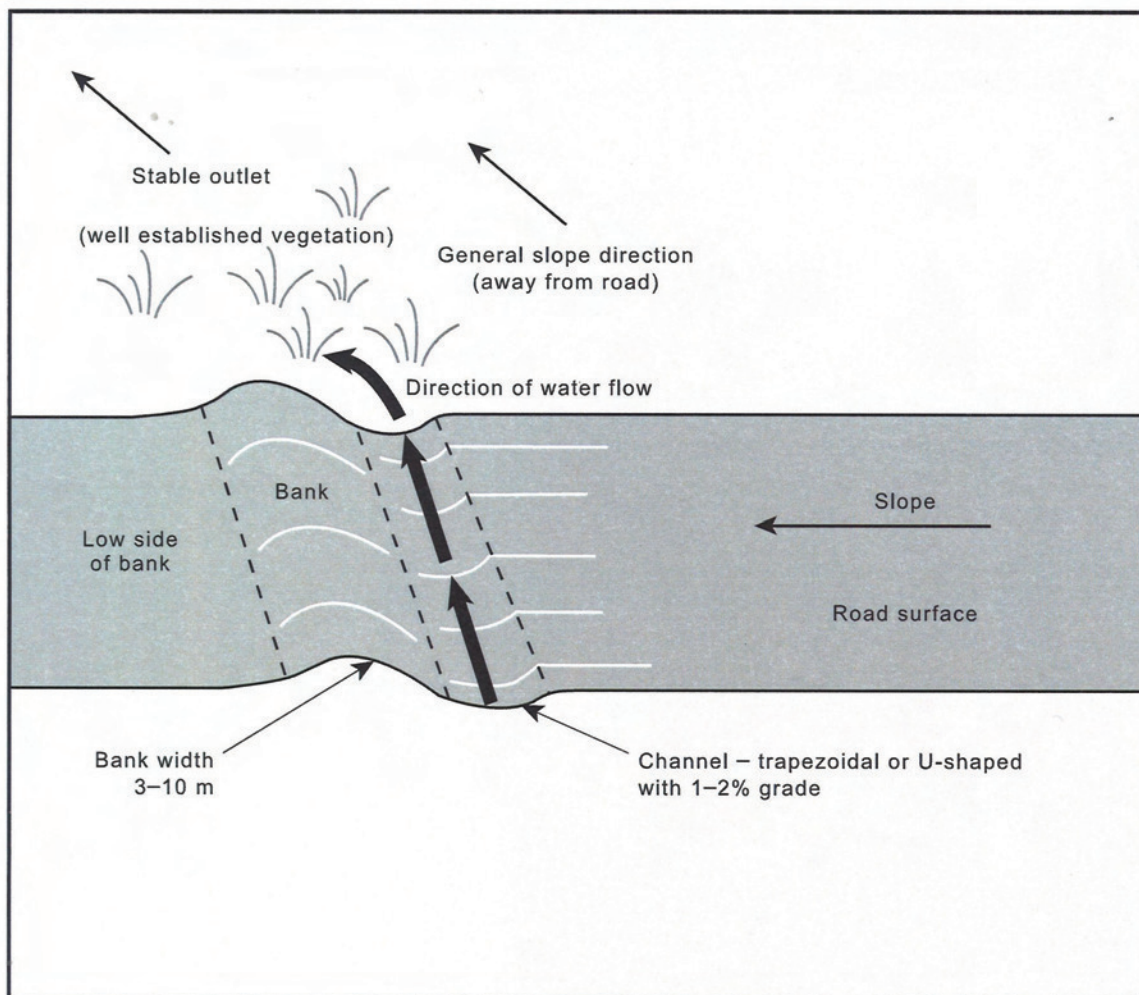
Typical cross bank layout and construction (Source: Managing Urban Stormwater; Soils and Construction – Volume 2C Unsealed Roads).
